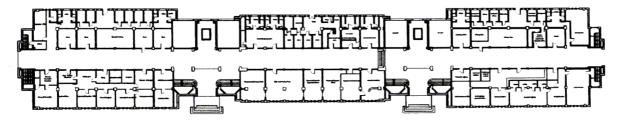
Ground Floor Plan Supreme Court Building, Ghana.
